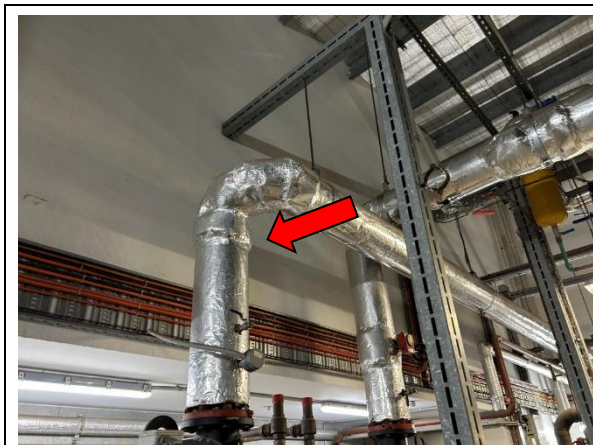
Roof Level, Boiler Room – SMF to pipework insulation
